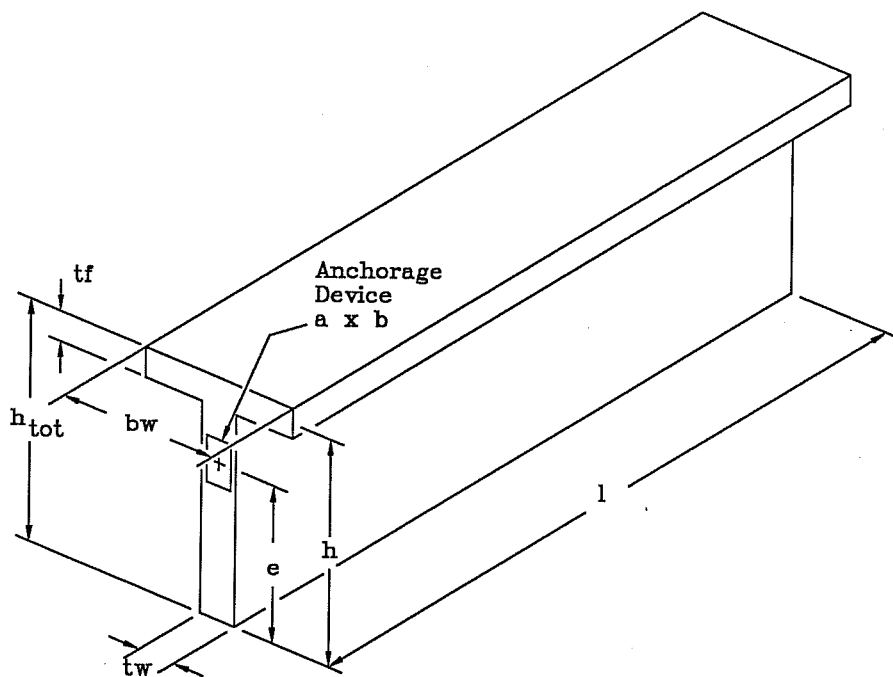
Geometry of the Model Used for the Finite Element Analyses of Anchorage Zones in Flanged Cross Sections
